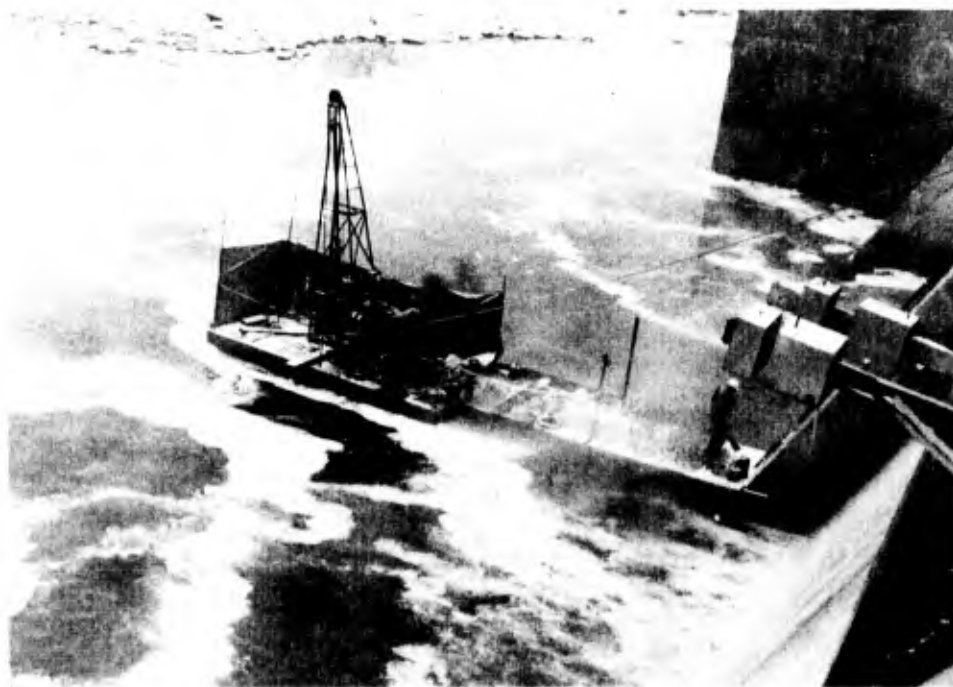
Floating plant with drill equipment behind dam, Brandon Road Lock and Dam, Illinois Waterway
